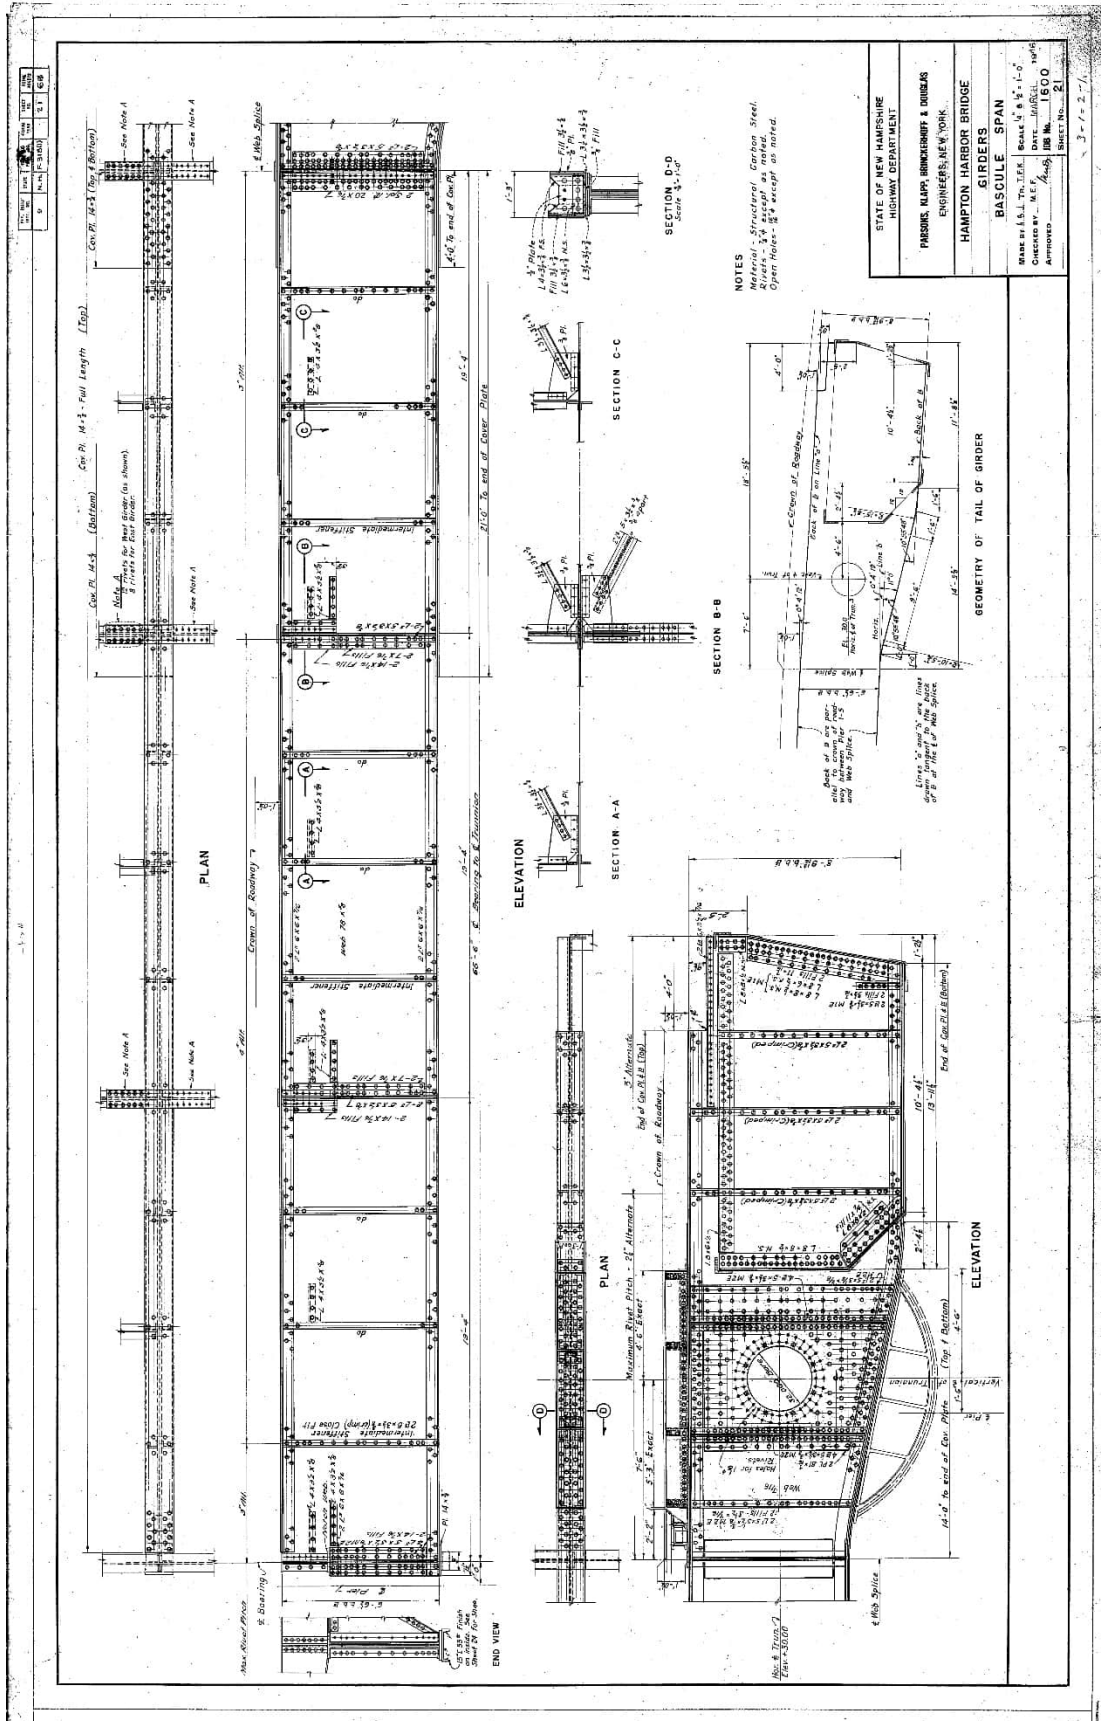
Girder and trunnion details, March 1946 (NHDOT).
